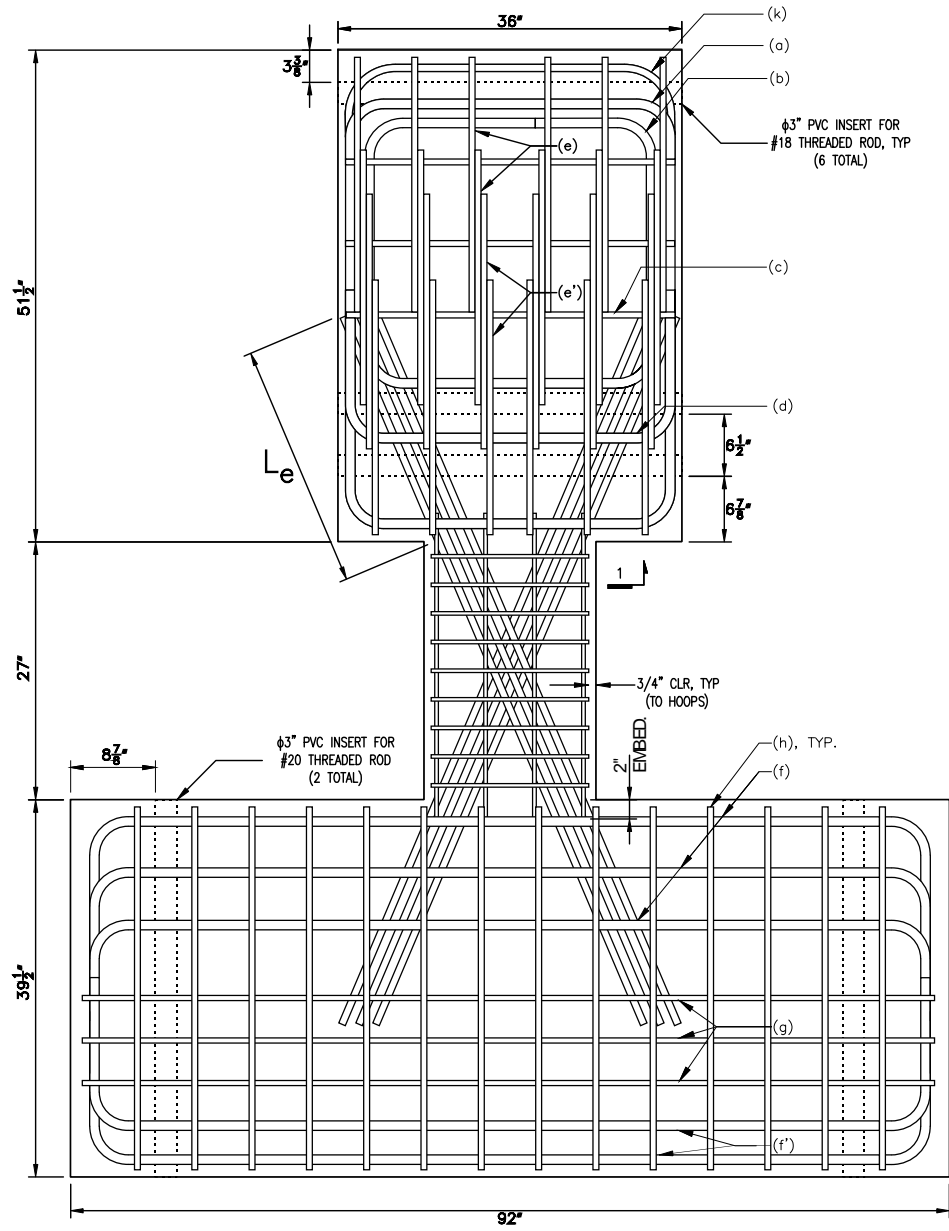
Elevation view of D100-1.5 (1 in. = 25.4 mm)
